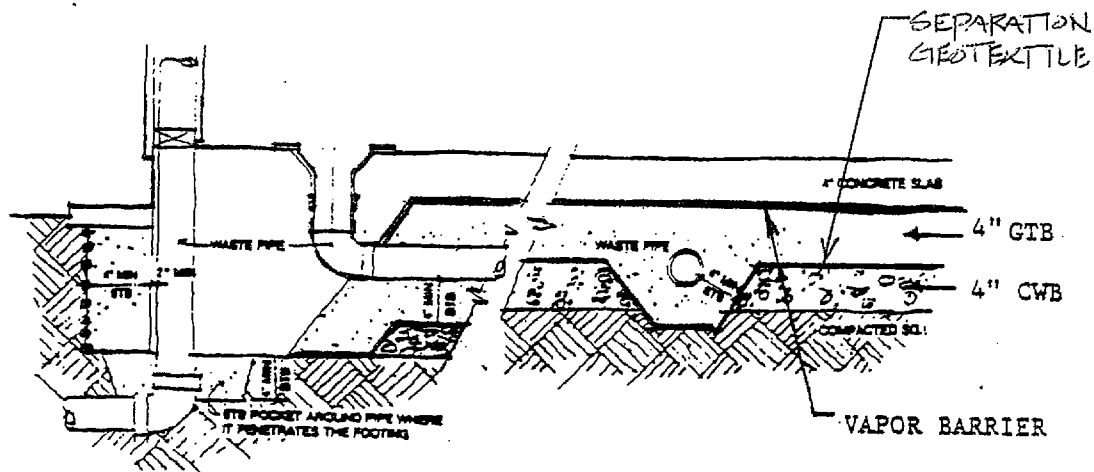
TYP. GTB DETAILS AT SUBSLAB DRAIN PIPING
